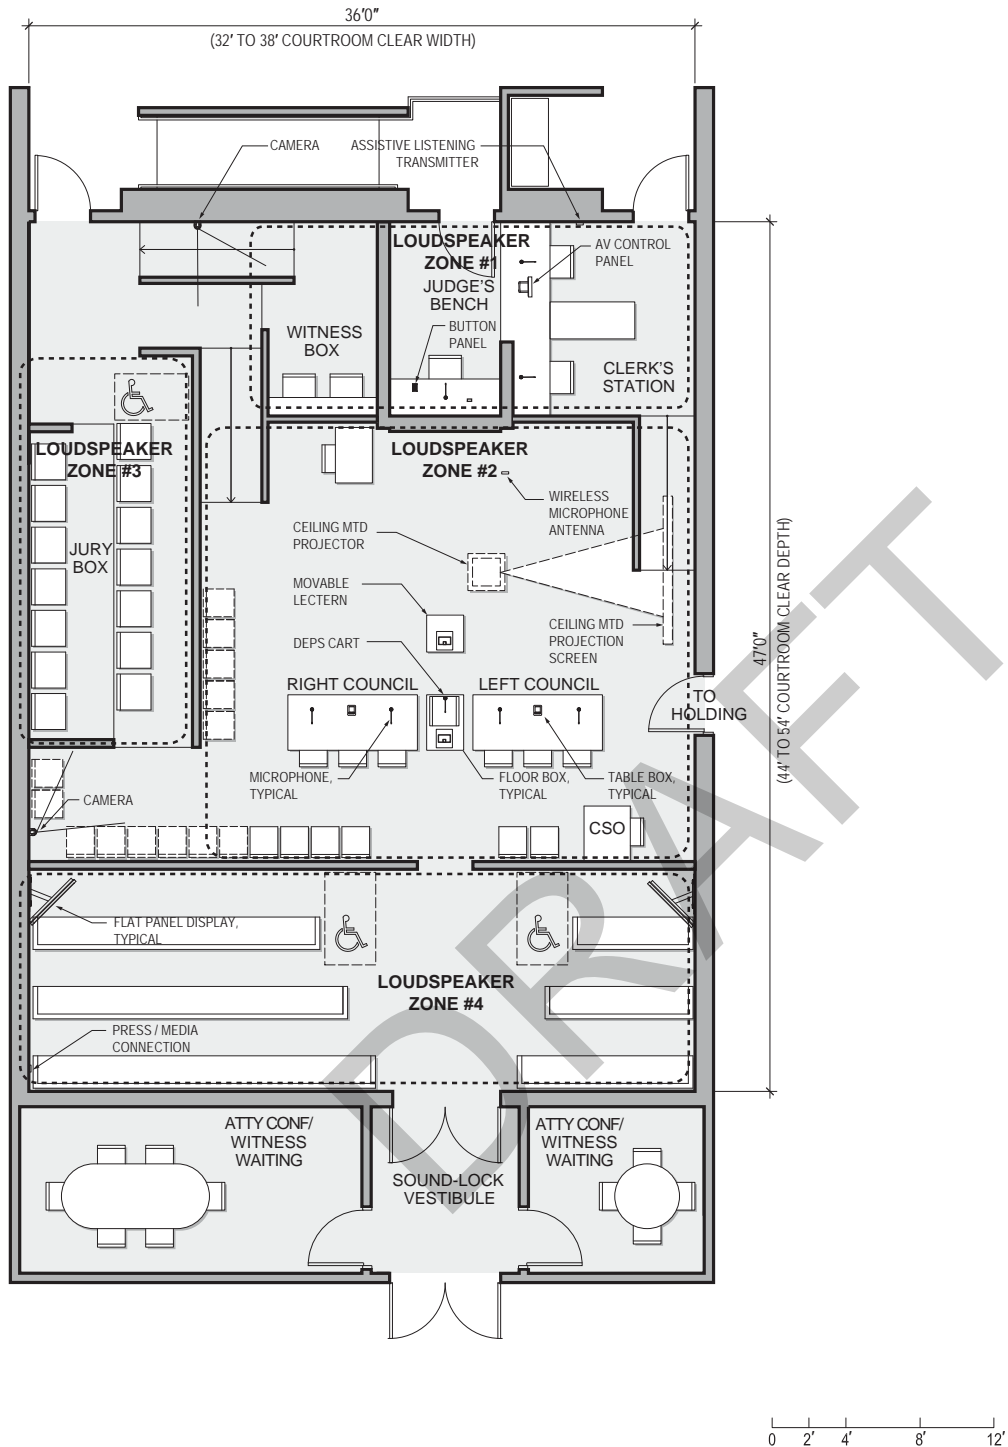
Typical Courtroom, Center Bench—A/V Requirement
